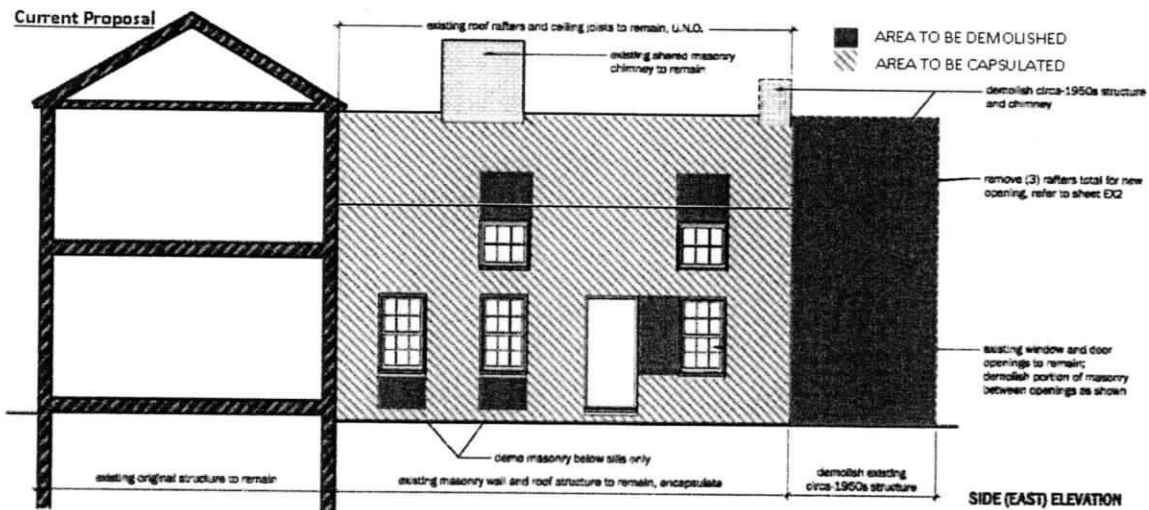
East (side) elevation of proposed work. Bottom shows area approved by BAR for demolition (solid red) and capsulation (hatched).
